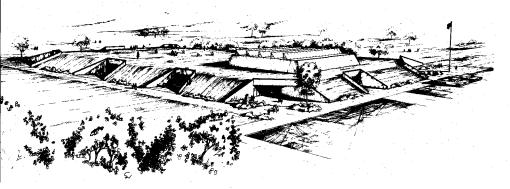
Amity School, Boise, Idaho. (Architect: Cline, Smull, Hamill, Quintieri Associates, Boise, Idaho.)
